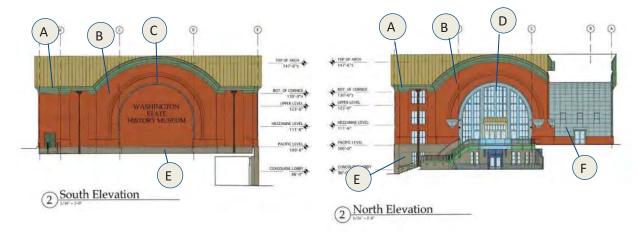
South Elevation of the building showing an overview of the typical cladding systems.
